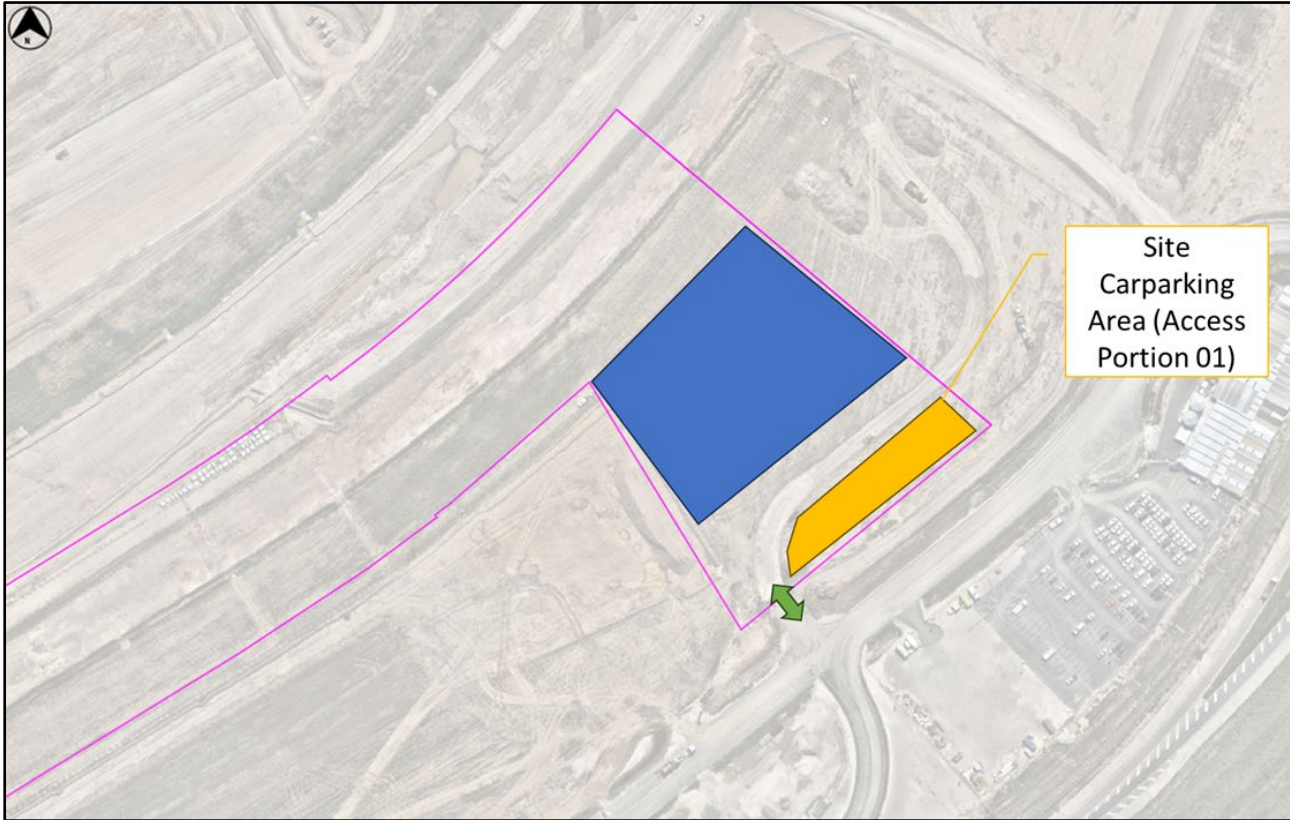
PROPOSED ACCESS PORTION 01 PARKING PLAN
